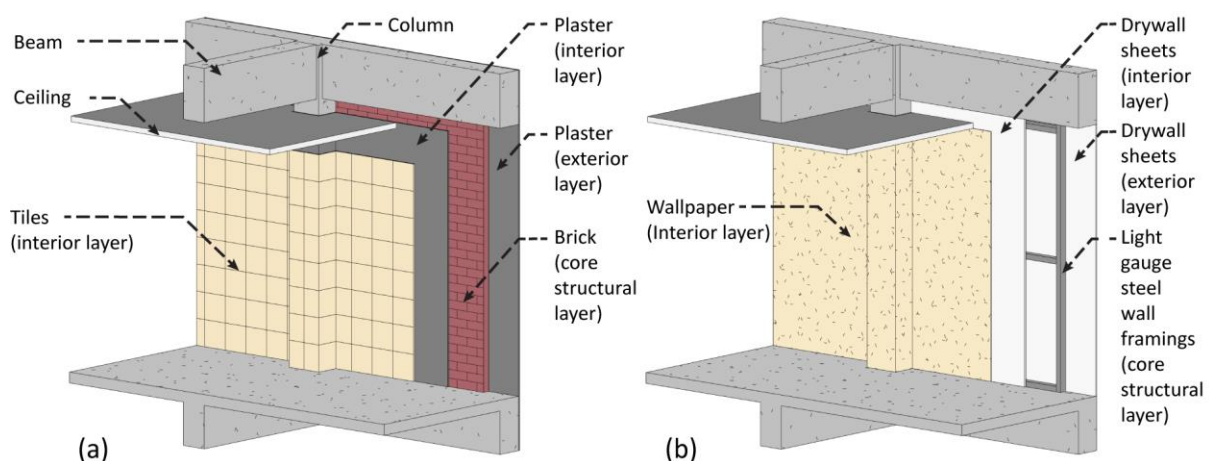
Example of (a) masonry wall layers and (b) drywall layers that have various sizes.
